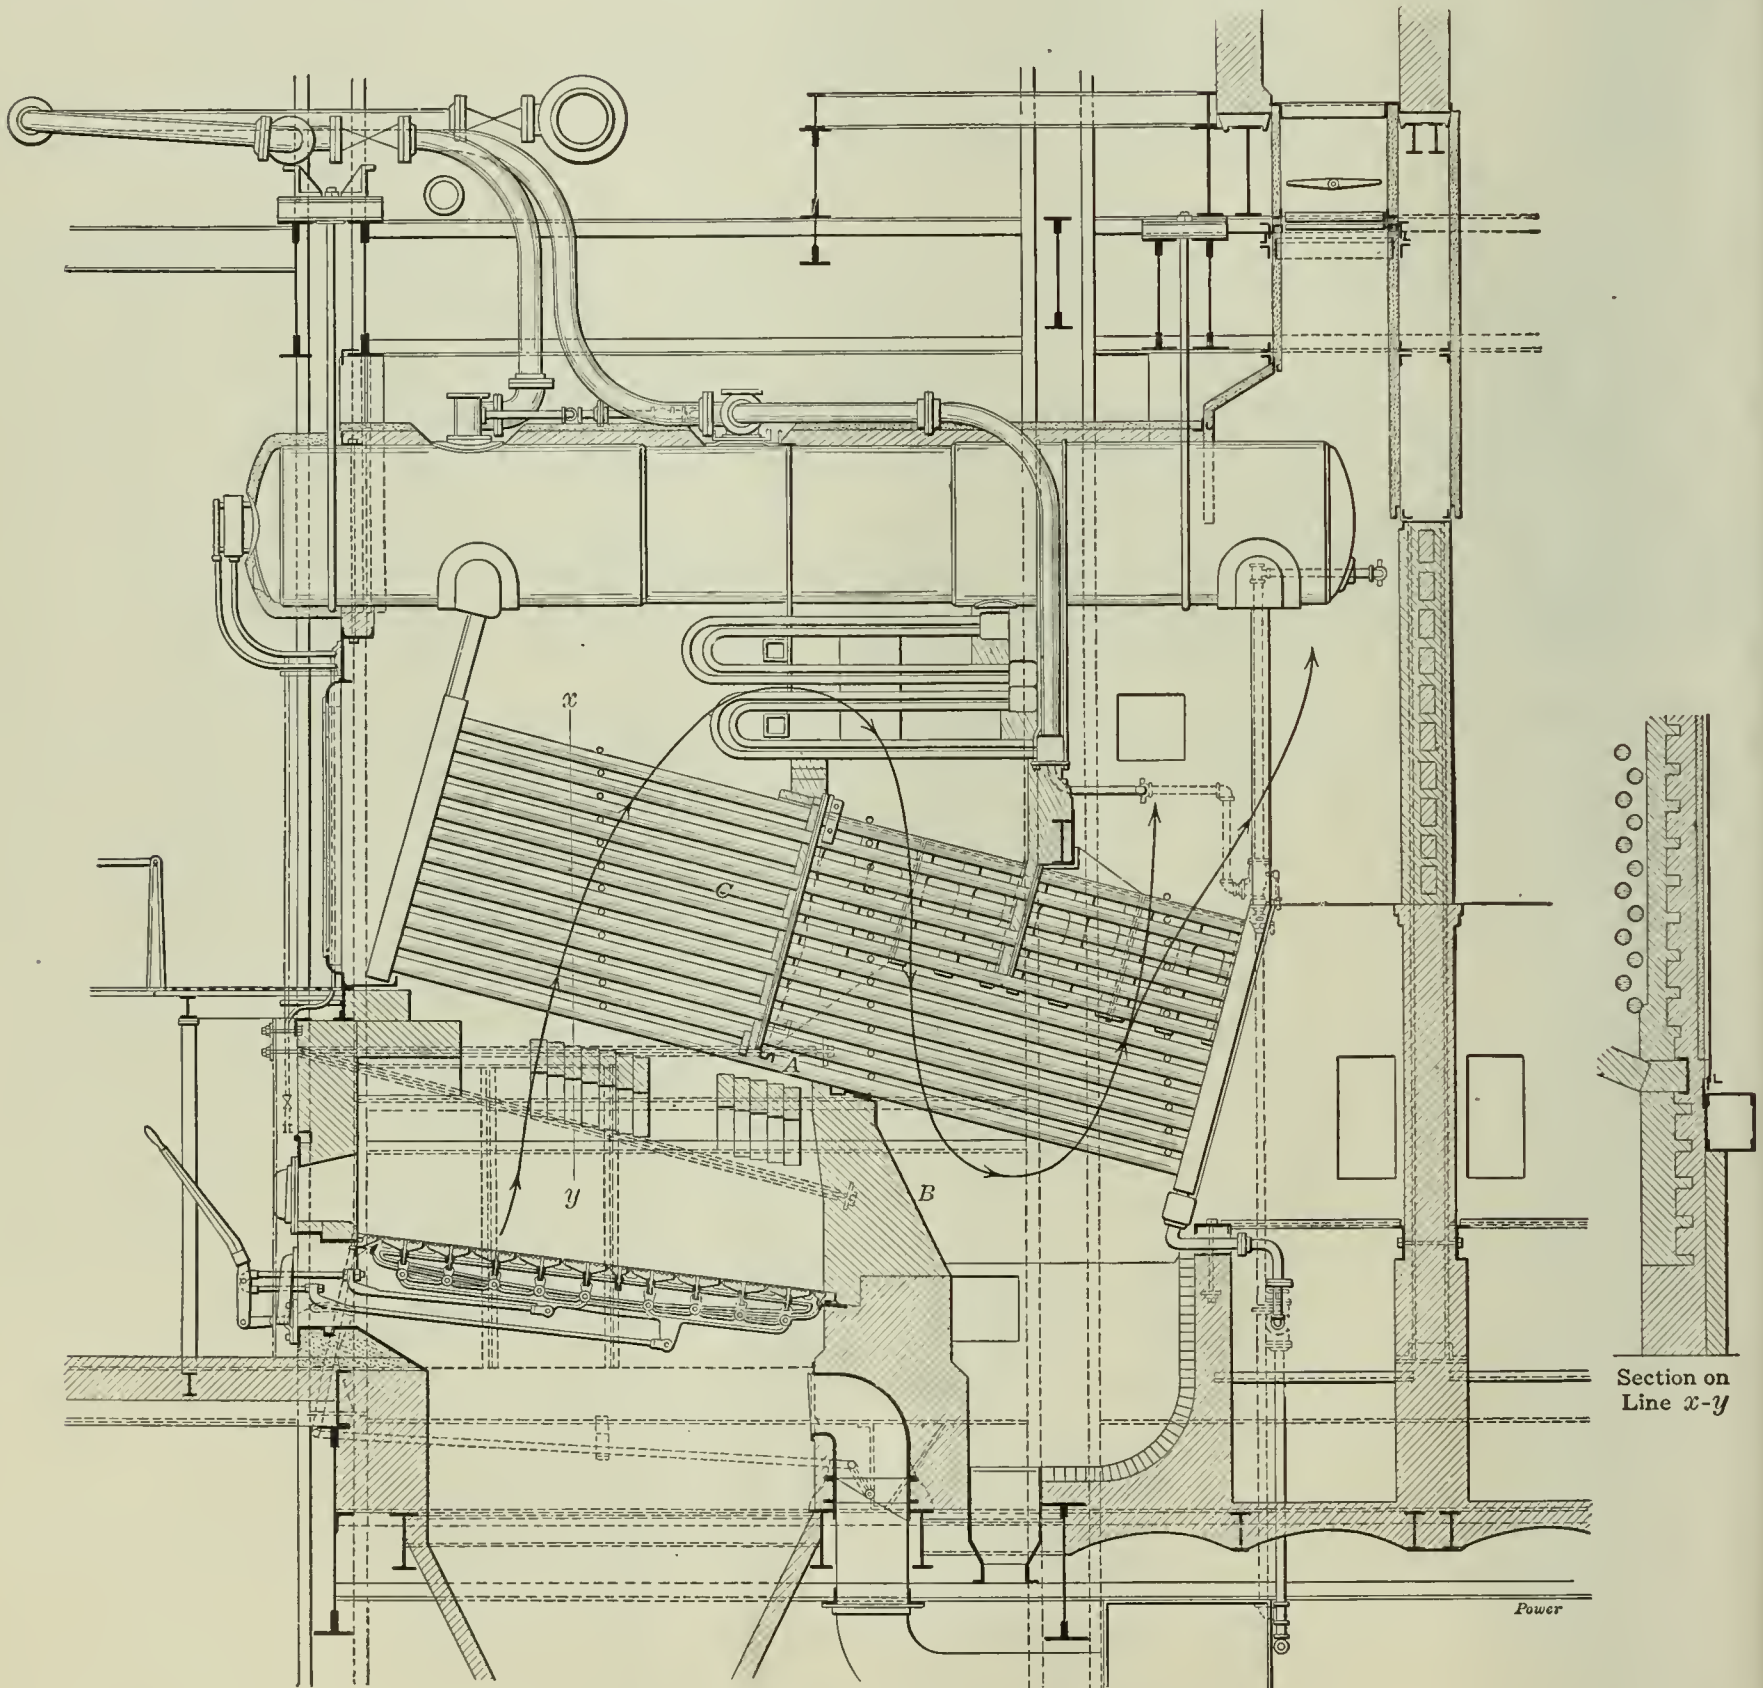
VERTICAL SECTION THROUGH BOILER SETTING
